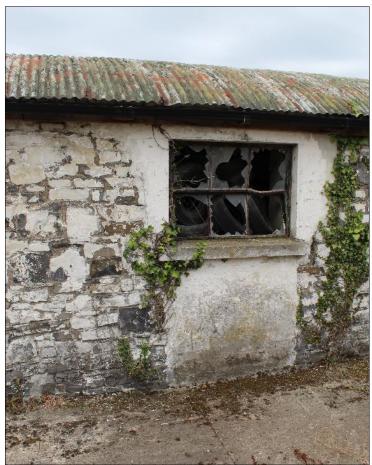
Detail of altered window opening with concrete sill and infill in rubble calp limestone masonry wall of lower farm building.
